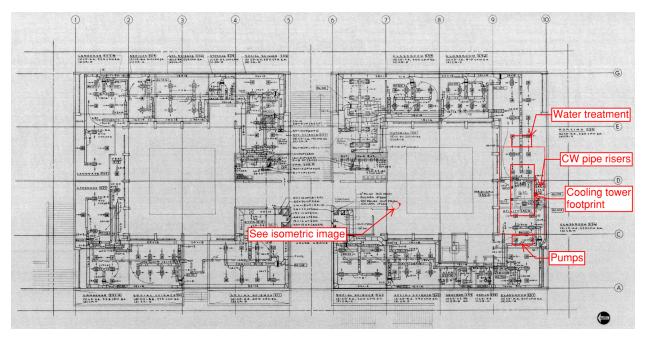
Plan view of potential cooling tower on Building E roof. Location 2.
